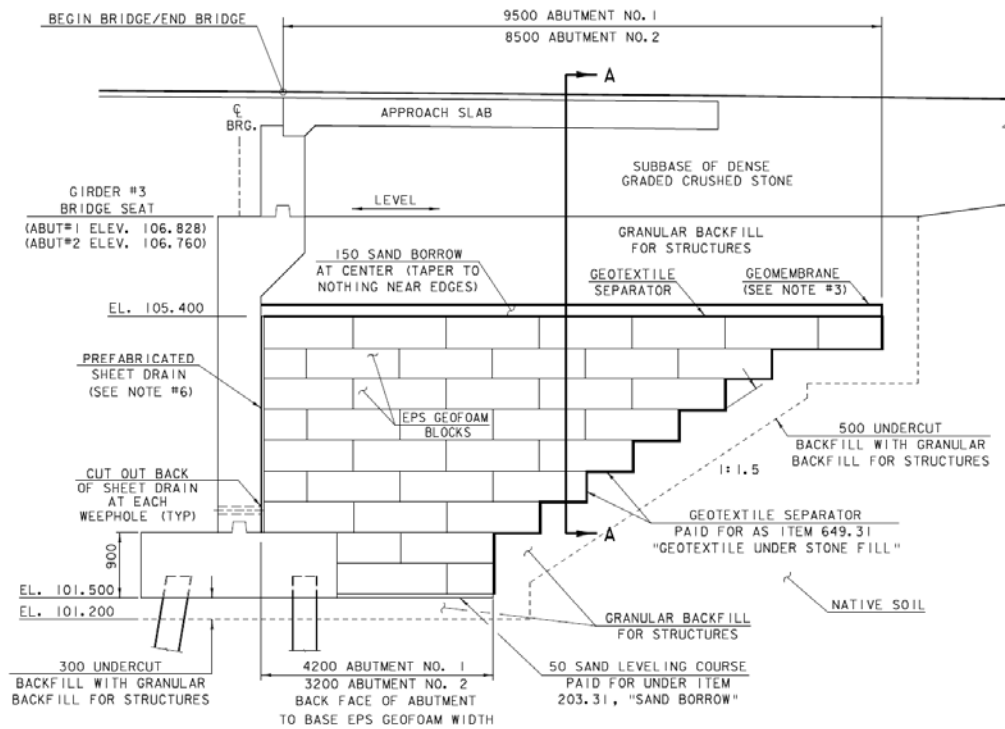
Typical Abutment Cross Section (Facing Perpendicular to Centerline).
